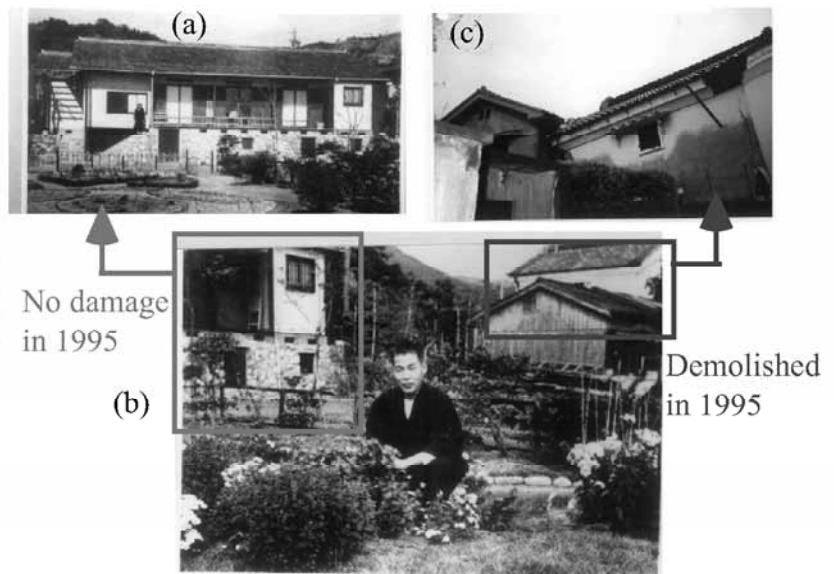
Contrast in damage extent between soft wooden house and rigid ware house (1995 in Kobe; black-and-white photographs in 1948)
